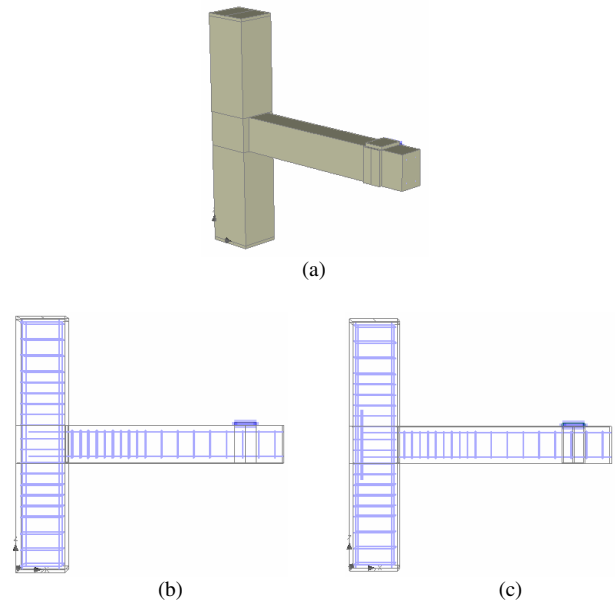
(a) specimen model; (b) headed bar configuration of reinforcement; (c) hooked bar configuration of reinforcement
